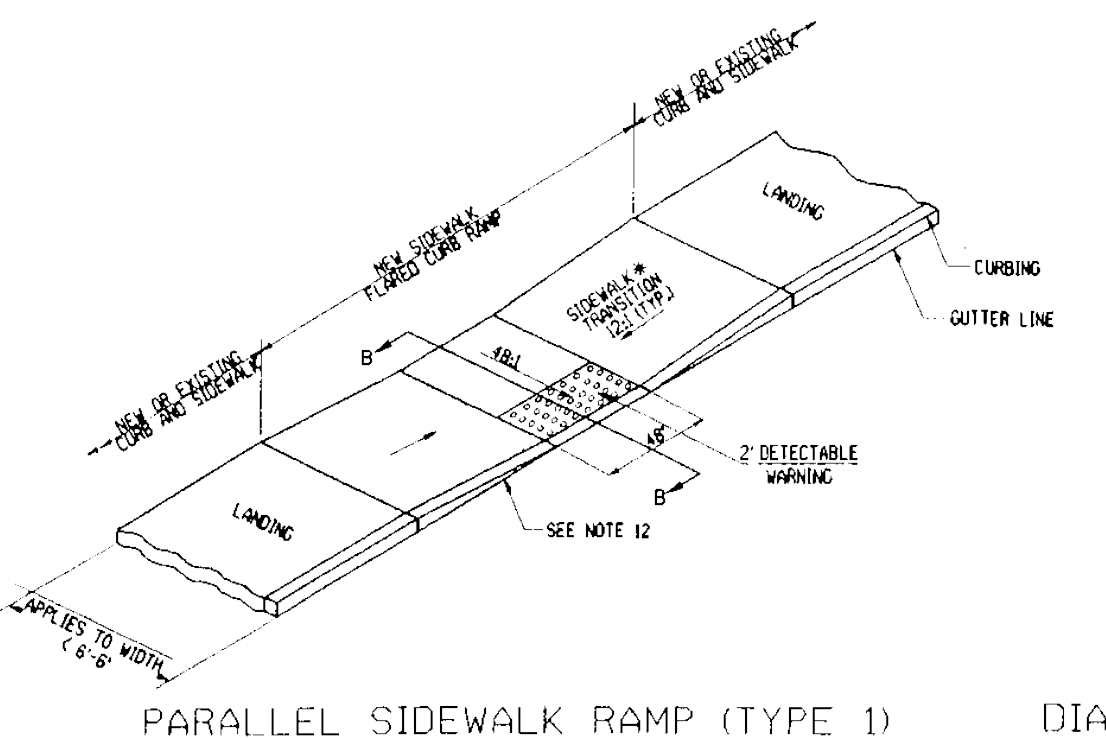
DETAILS OF CONCRETE RAMP WHERE SIDEWALK ADJOINS CURBING
